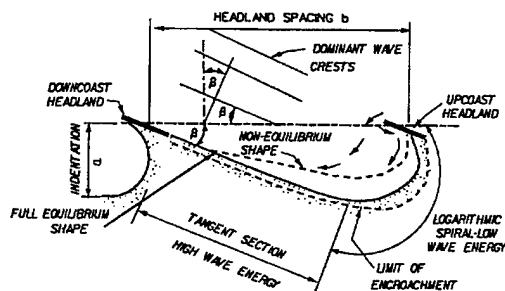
Definition sketch of an artificial headland breakwater system and beach planform
